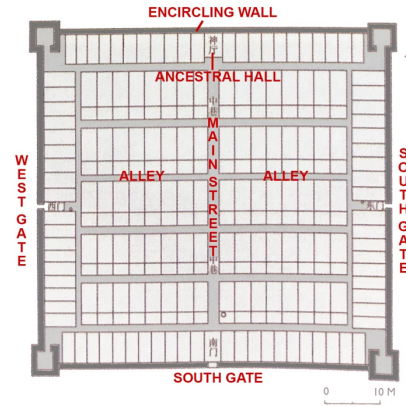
A diagrammatic plan of the Yuanxun walled village/neighborhood in Sungang Village in Shenzhen
